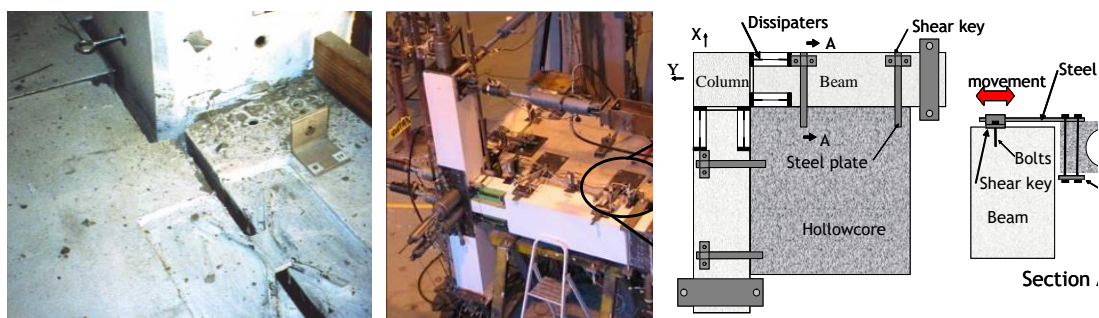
Left: “X-connectors between precast floor (pre-topped double-tee) units and frames as implemented in the PRESS Five Storey Building (Priestley et al., 1999). Centre and right: “Articulated floor” system - concept, connection details (Amaris et al., 2007)
